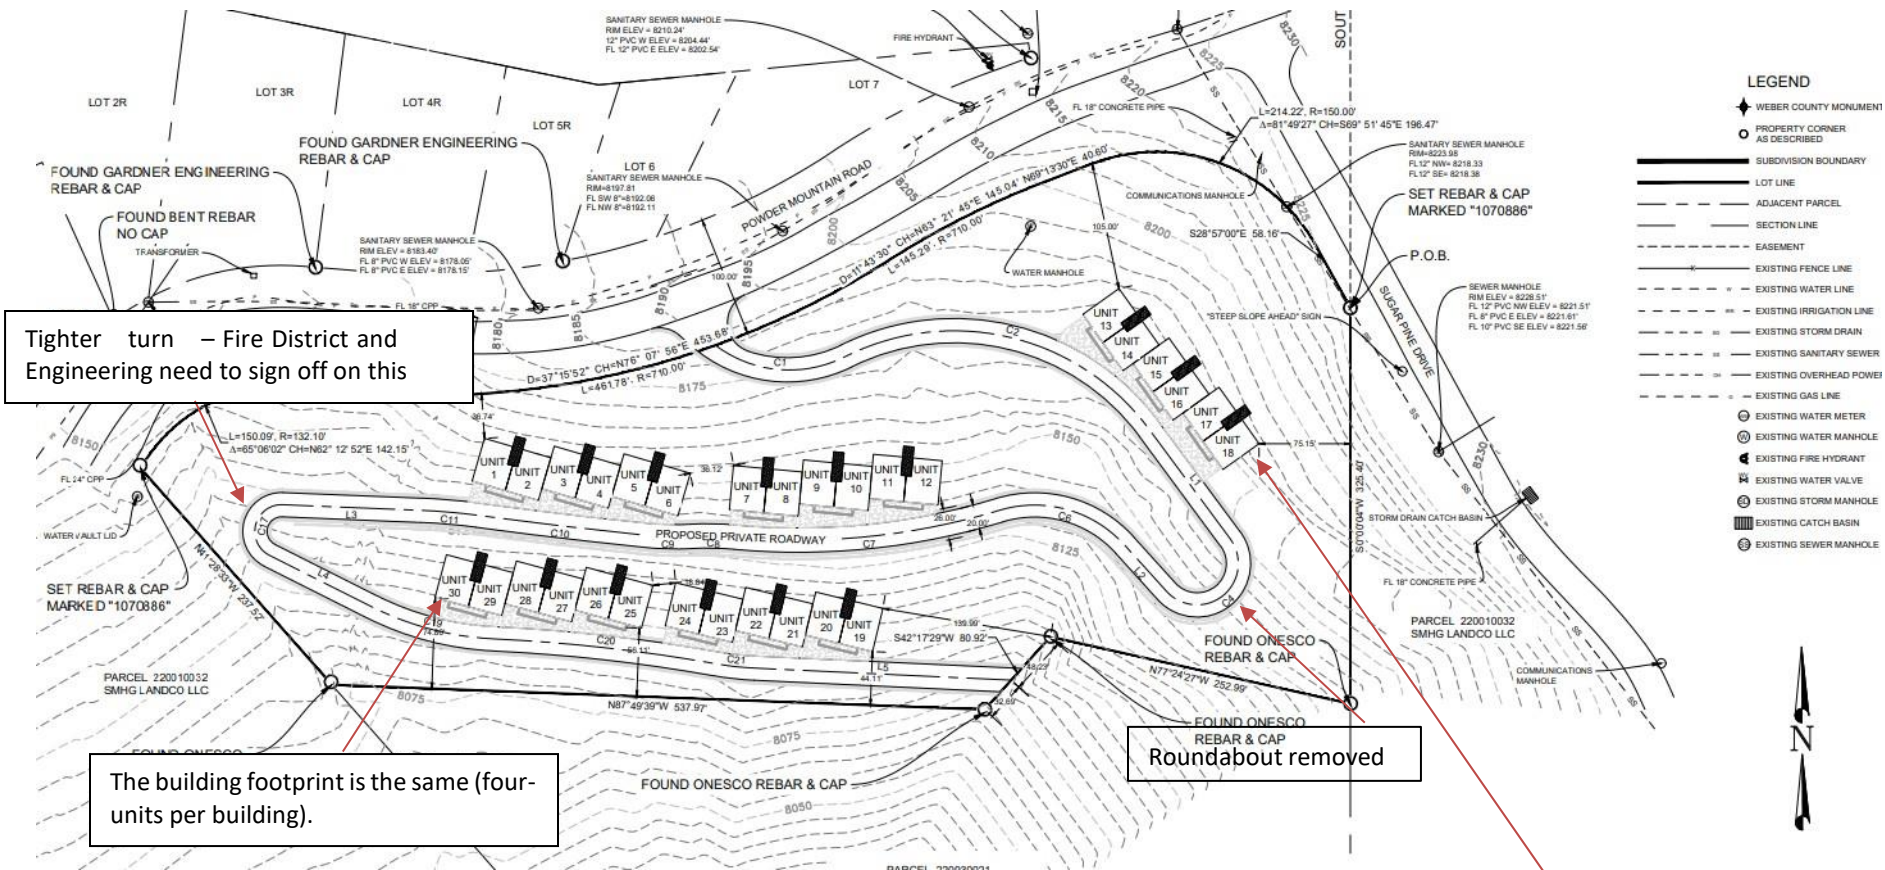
Exhibit D- Proposed Plat, and Changes from Original Site Plan
